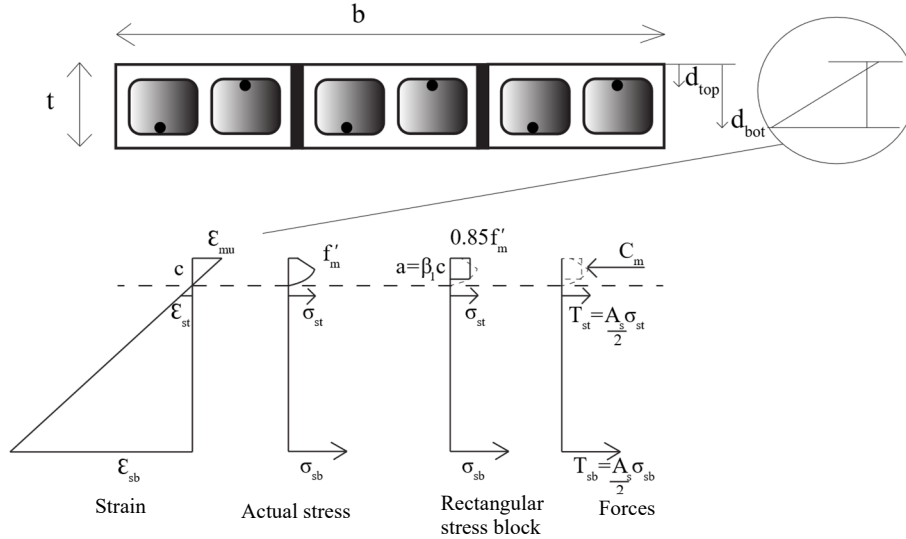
Strain profile, stress profile, and resultant forces for DR masonry walls.
